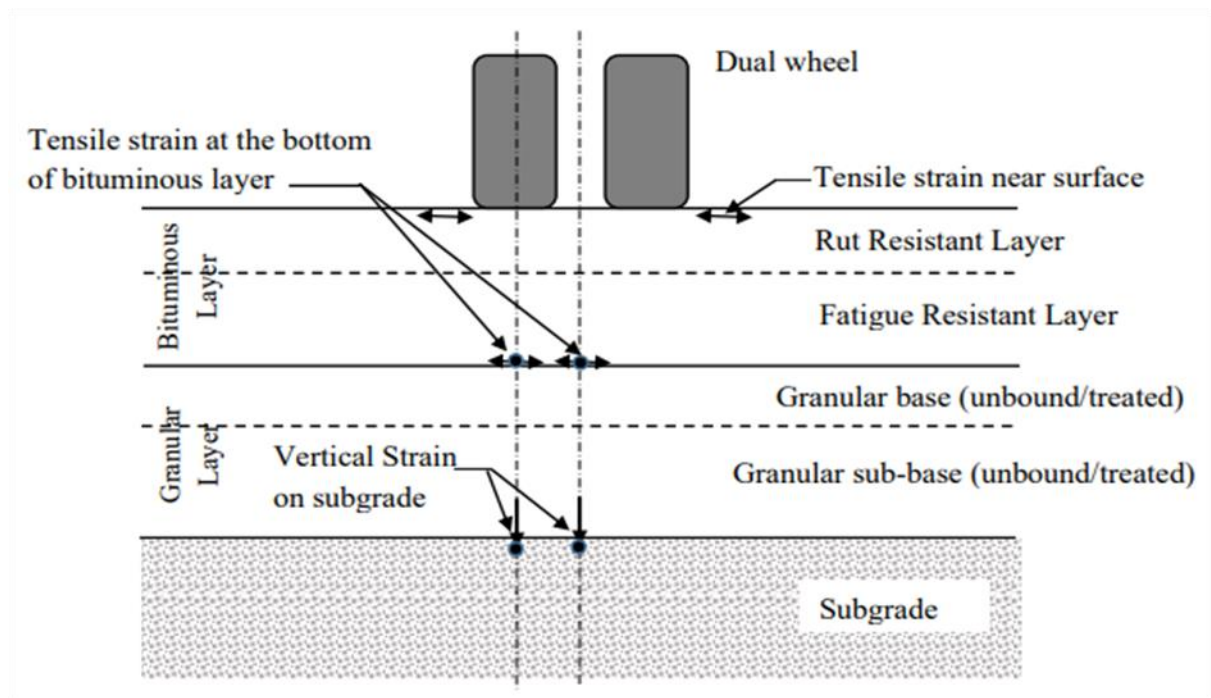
STRESS AND STRAIN IN A FLEXIBLE PAVEMENT
